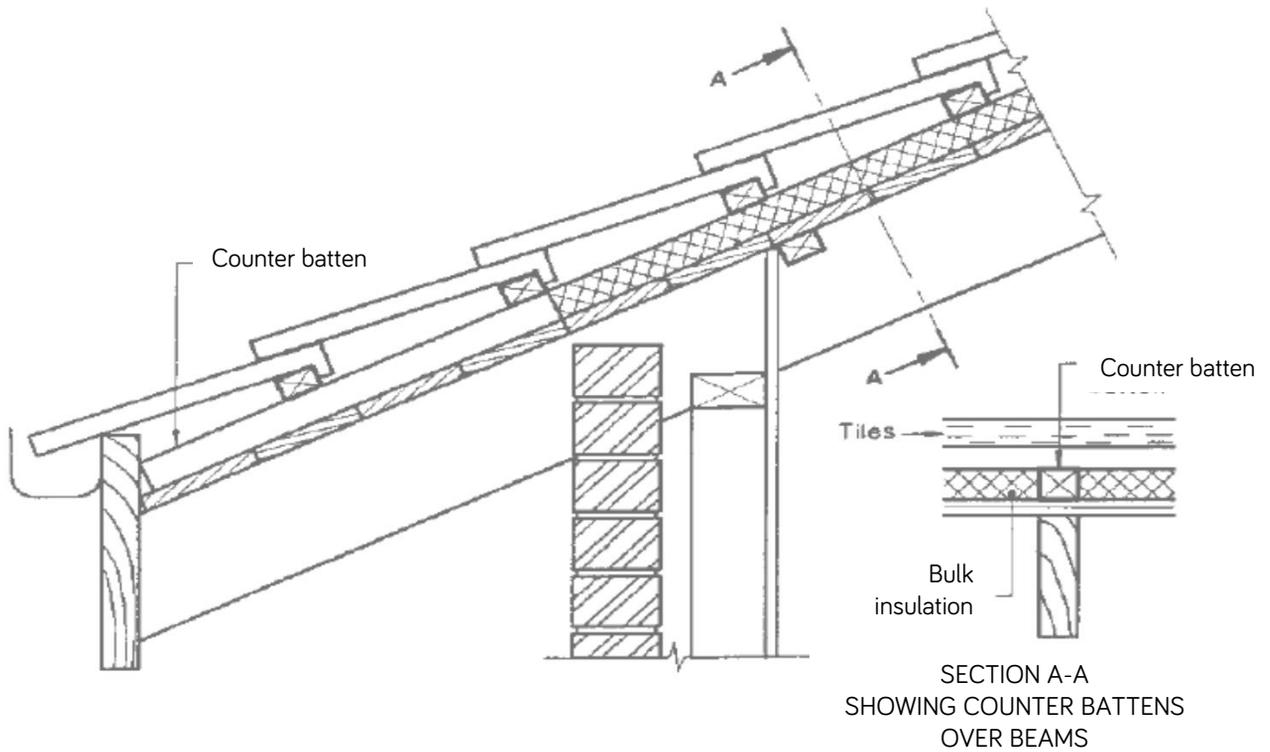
Bulk Insulation between counter battens / Insulation of sloping ceiling with pitched tiled roofs.
